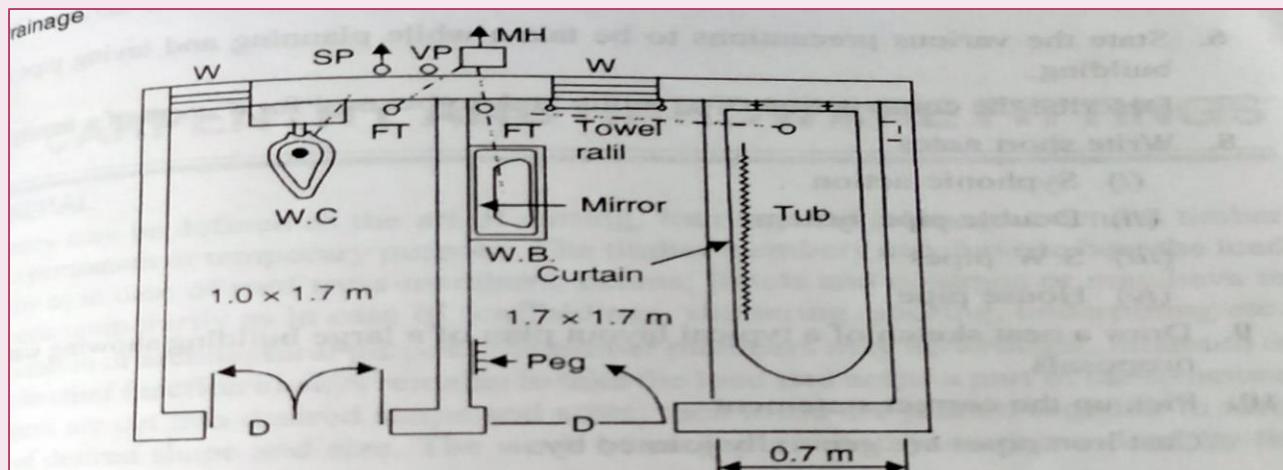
Typical arrangements of bathroom fixtures in a residential building.
